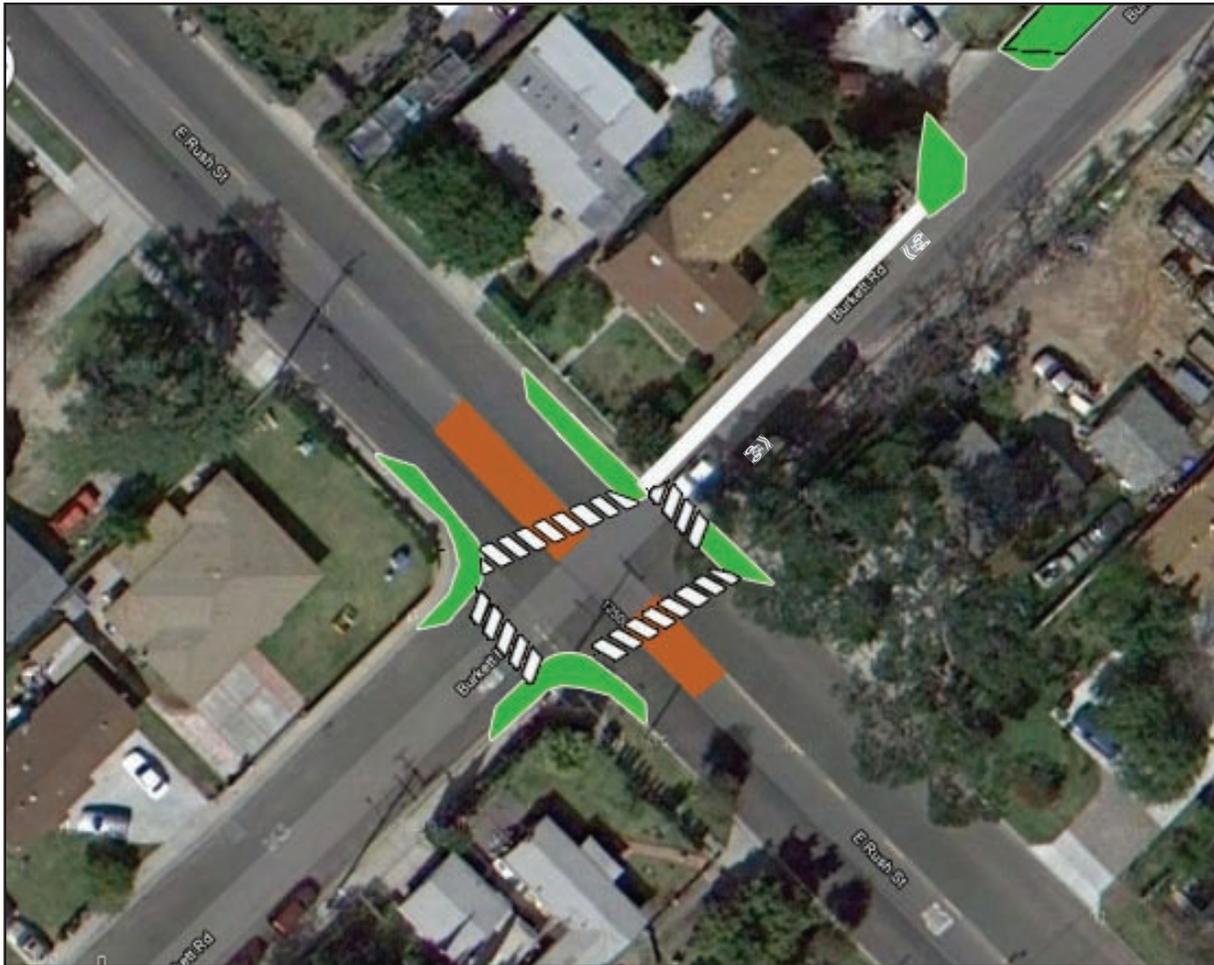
Intersection and pathway improvements near Burkett Road and Rush Street intersection.
